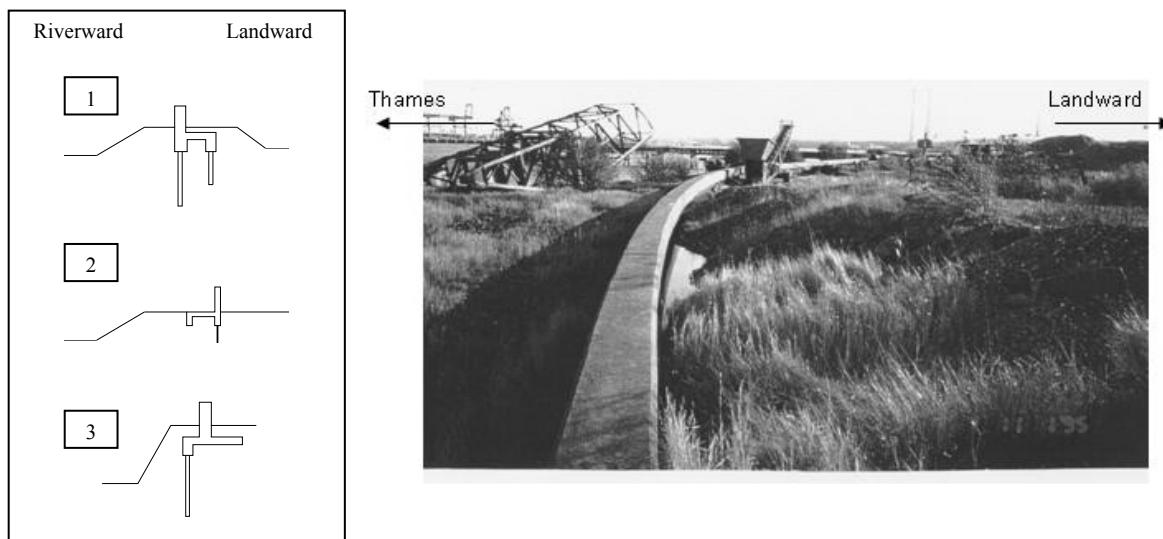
The three reinforced concrete wall types implemented in the reliability analysis (left), a picture of reinforced concrete walls along the flood defence line (right).
